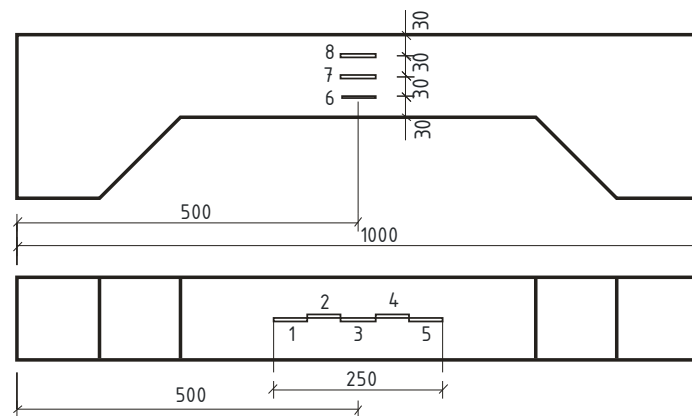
The scheme of arrangement a strain sensors on the concrete surface
